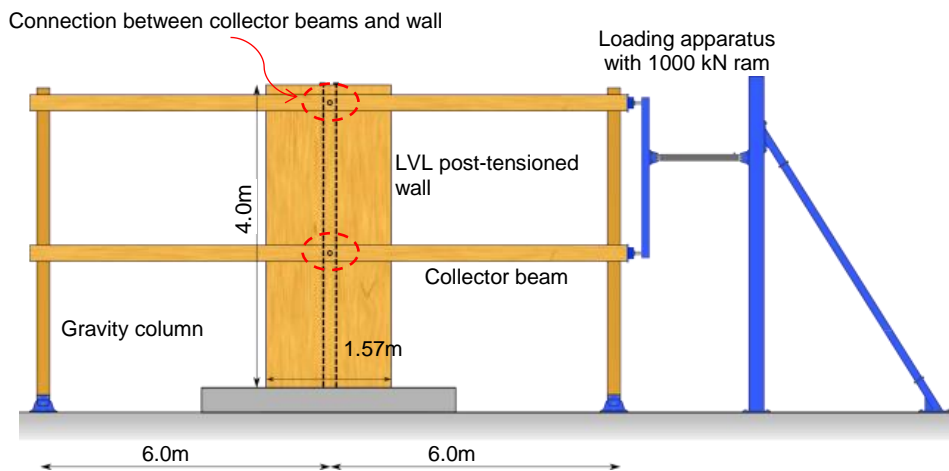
Test setup of the post-tensioned wall loaded through collector beams which were connected to the wall by several connection details (setup with end columns not shown)
